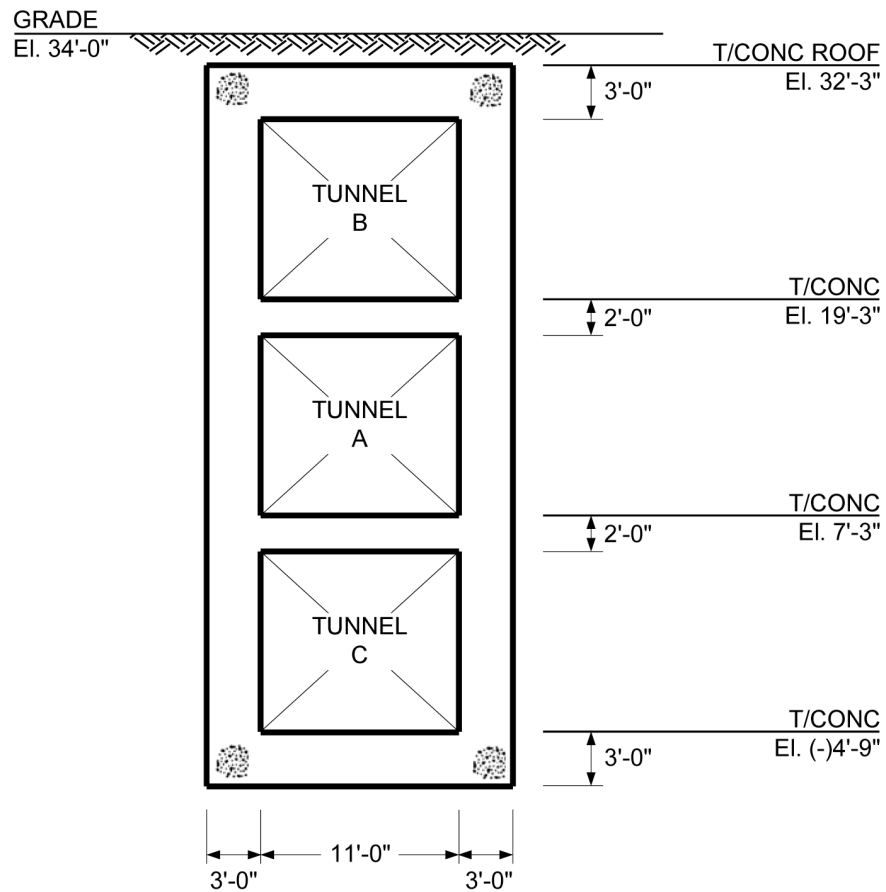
H.6-249 Typical RSW Piping Tunnel Section
